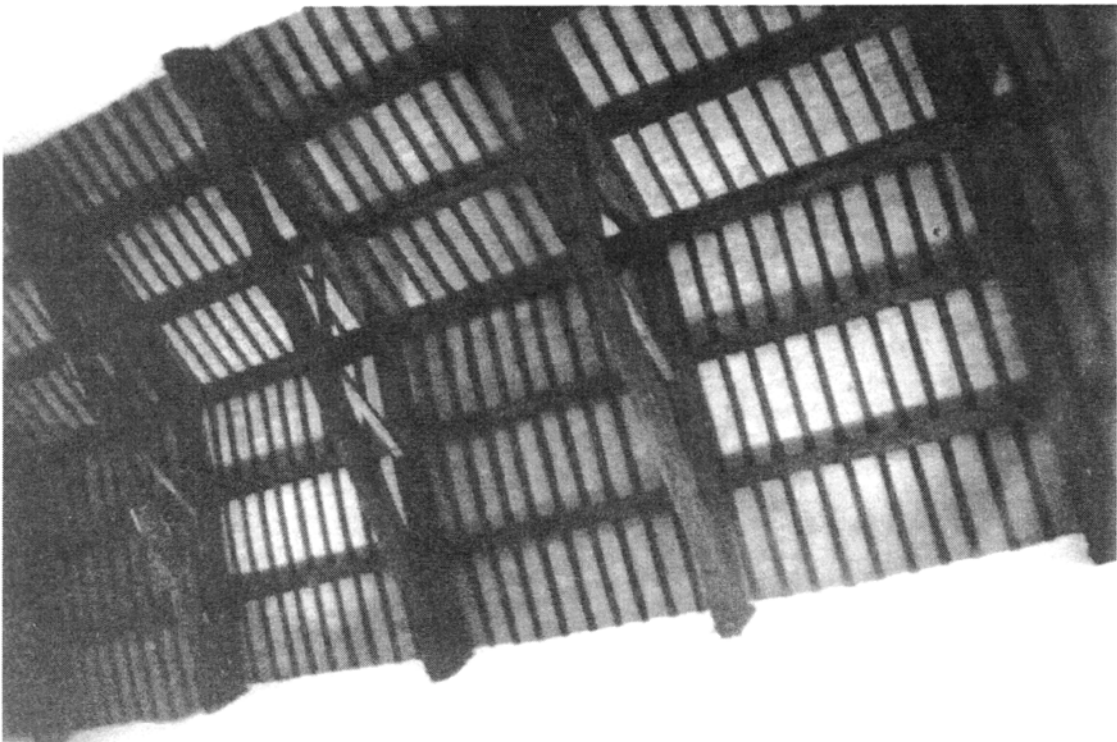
Santa Maria Maggiore: the truss roof structure
